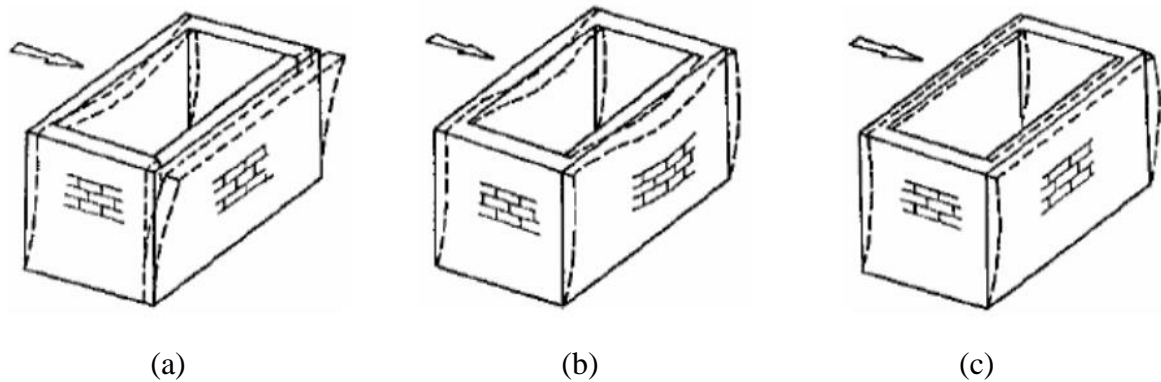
Vibration of masonry buildings during earthquake. Building with wooden floors without ties (a), building with wooden floors and tied walls (b) and building with rigid floors and tie-beams (c) from Tomazevic [28].
